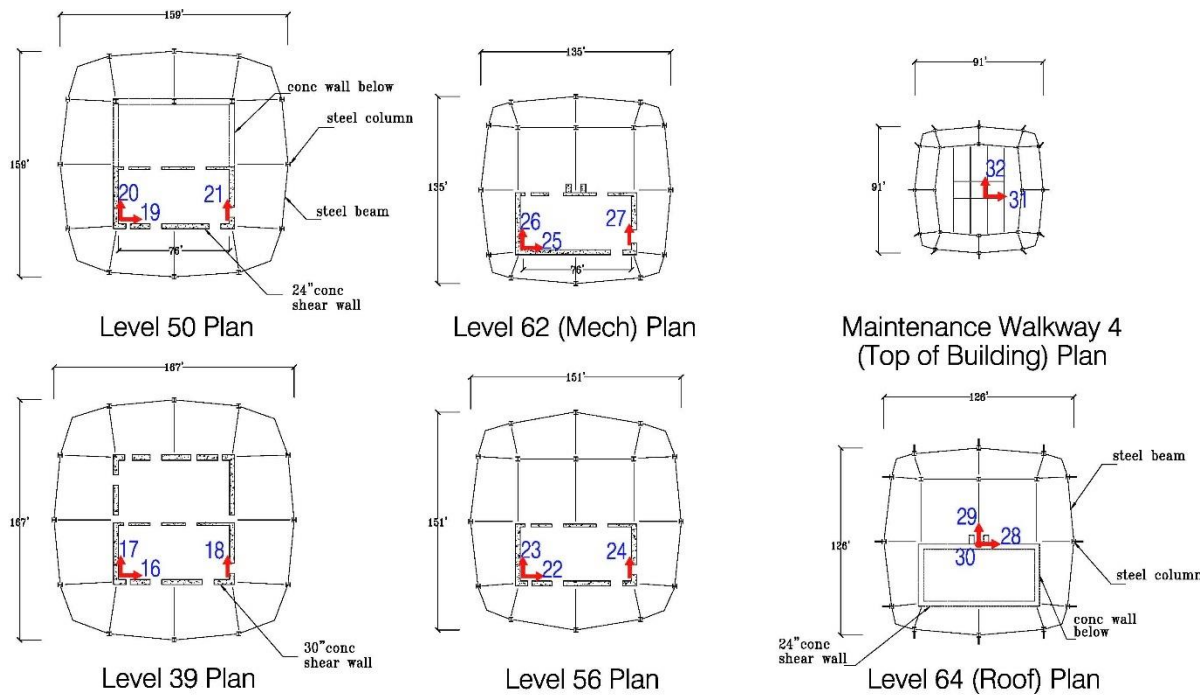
Sensor locations at the 41st Floor and above at Wilshire Grand Tower.
